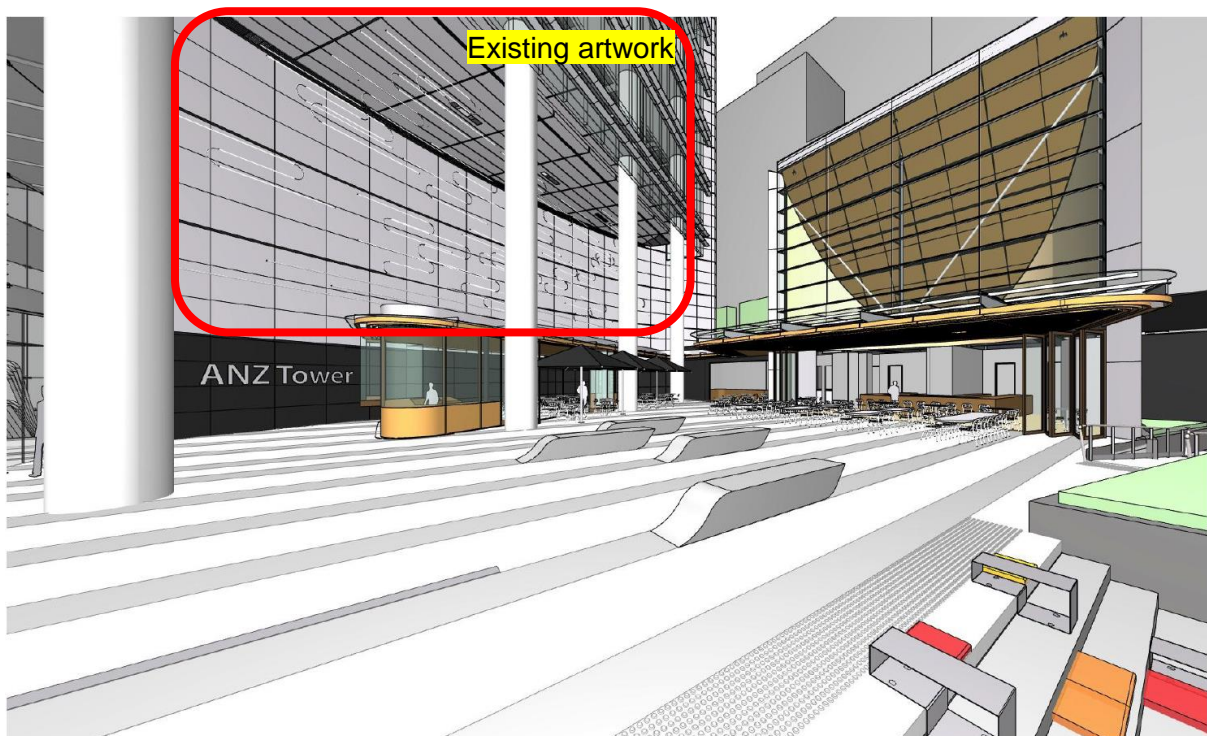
3D perspective of proposed pavilion addition and artwork directly above (outlined in red).
